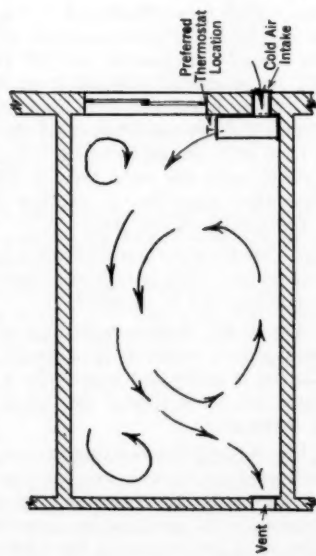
SECTION THROUGH A UNIT VENTILATOR-EQUIPPED ROOM WHEN HEATING
